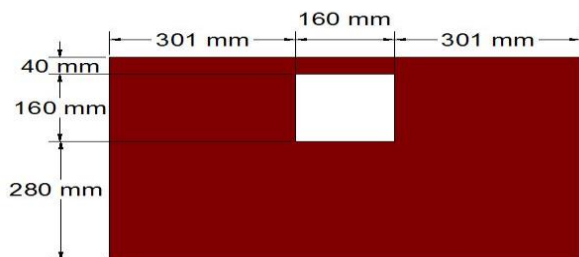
(c) Middle top opening in the wall (MTO)
